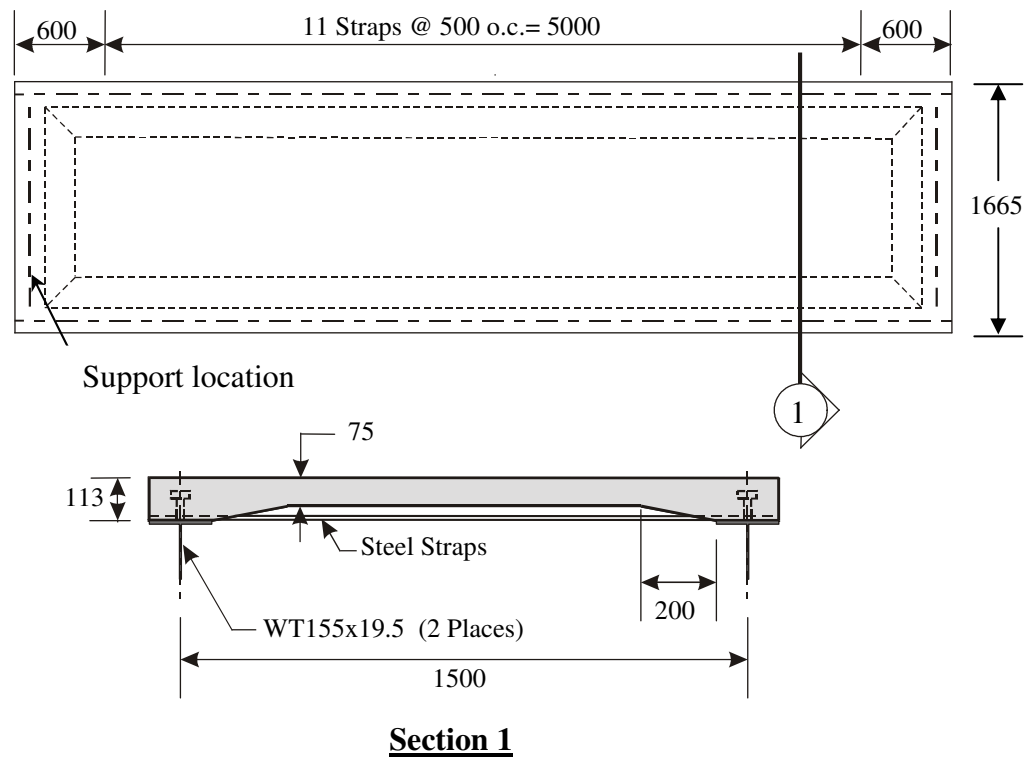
The slab-on-girder bridge deck model used for the study (dimensions in mm).
